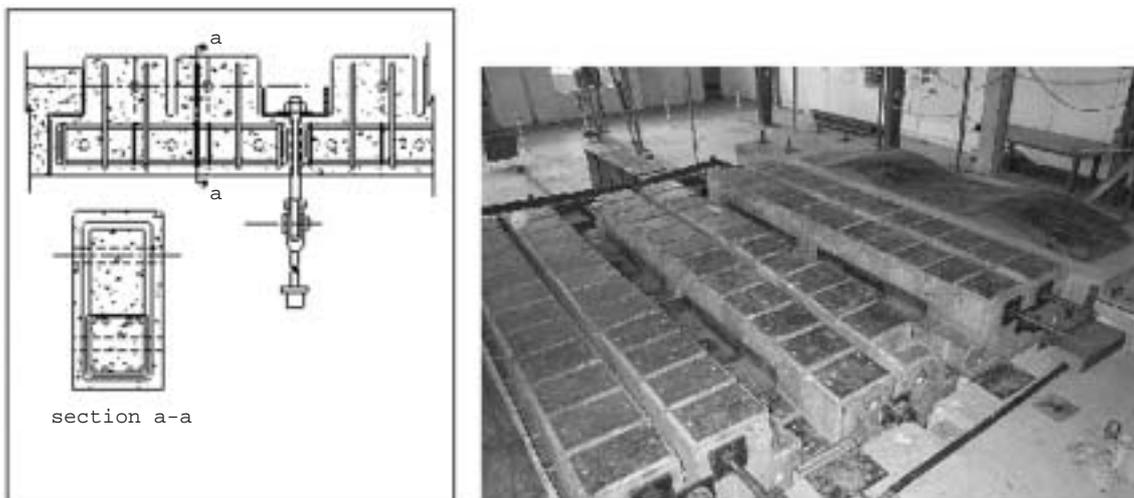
Detail of concrete blocks and tie-down cables with accompanying photograph of the three Voussoir beams
